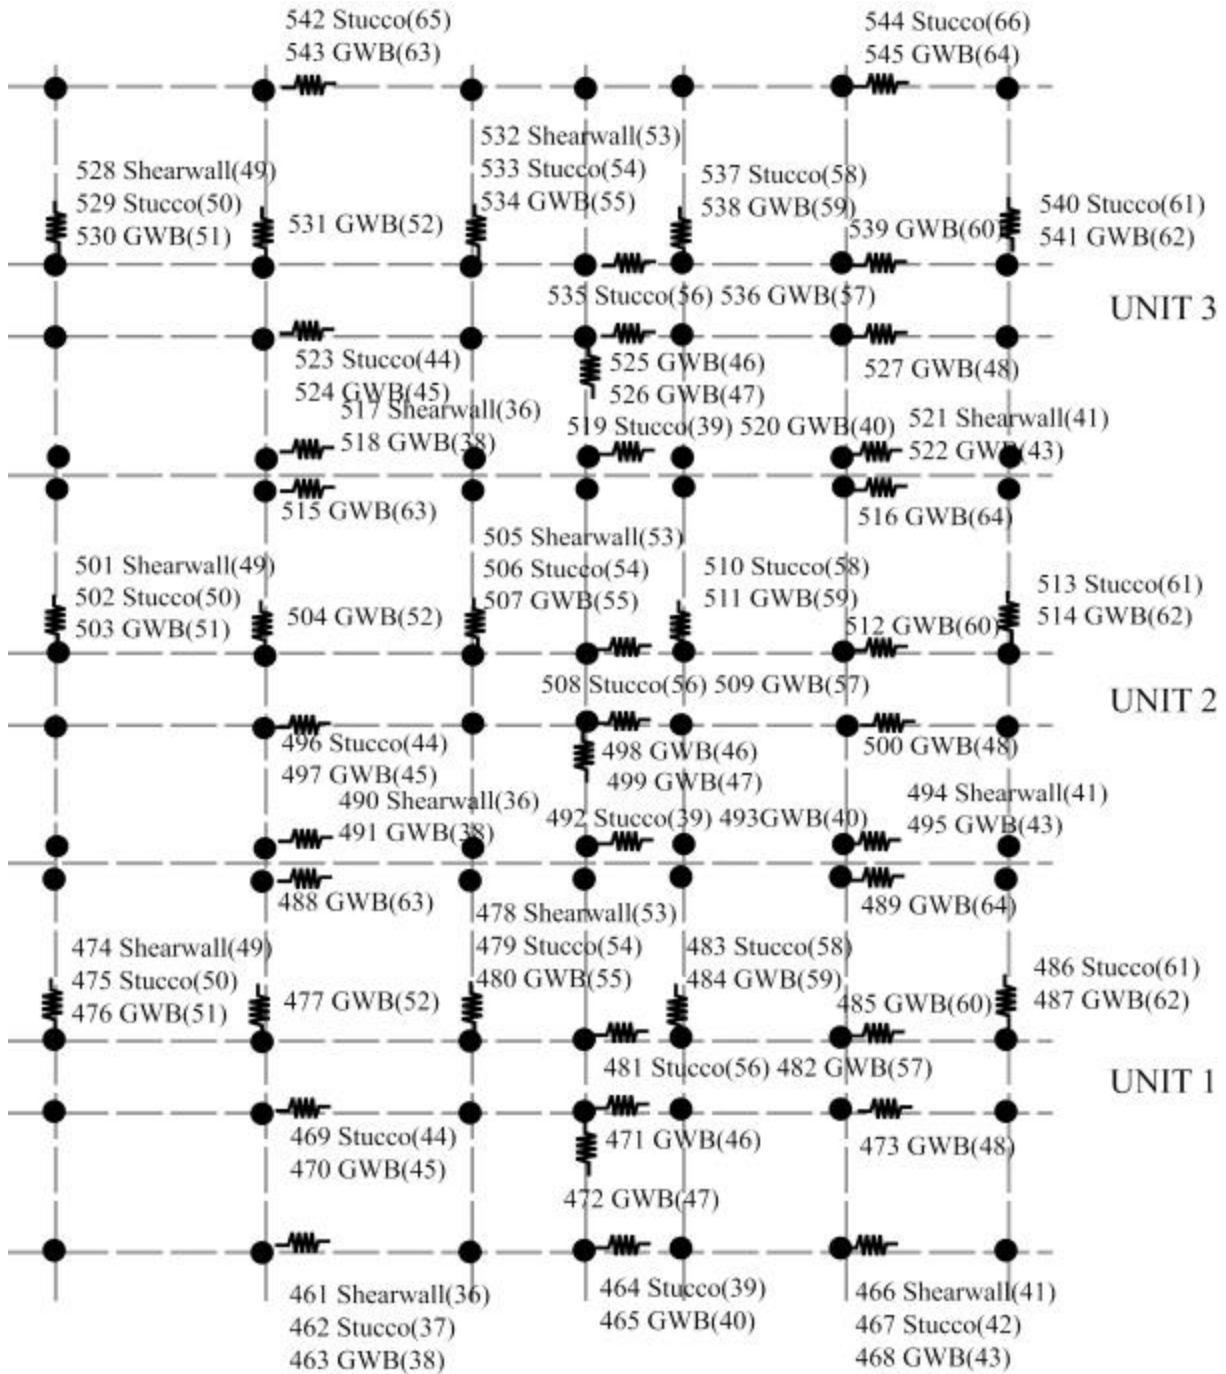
Locations, Orientation and Numbering of Shear Element for Interior and Exterior Vertical Walls on the Second Floor of the Townhouse Index Building.
